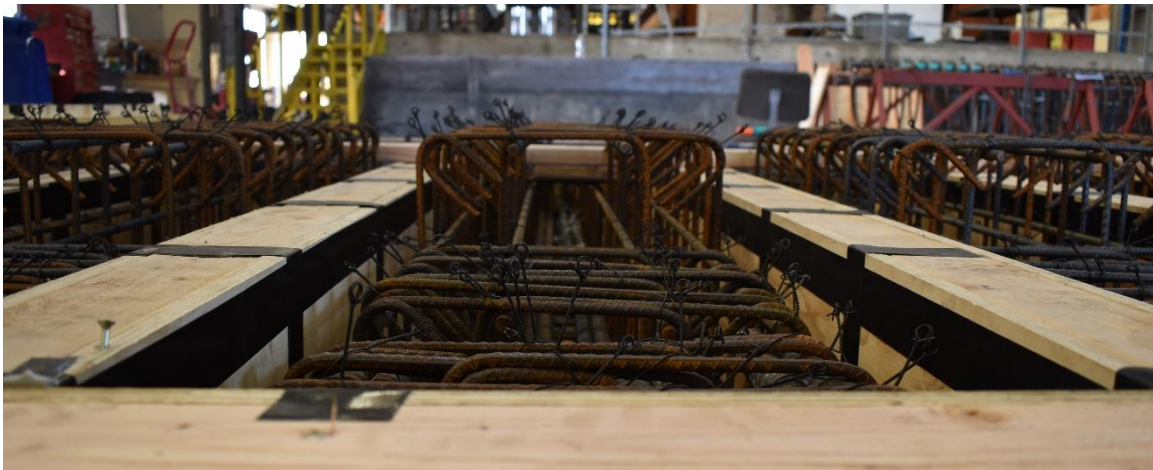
Beam substrate showing stirrups on non-failure end that extend into topping as interface reinforcement.
